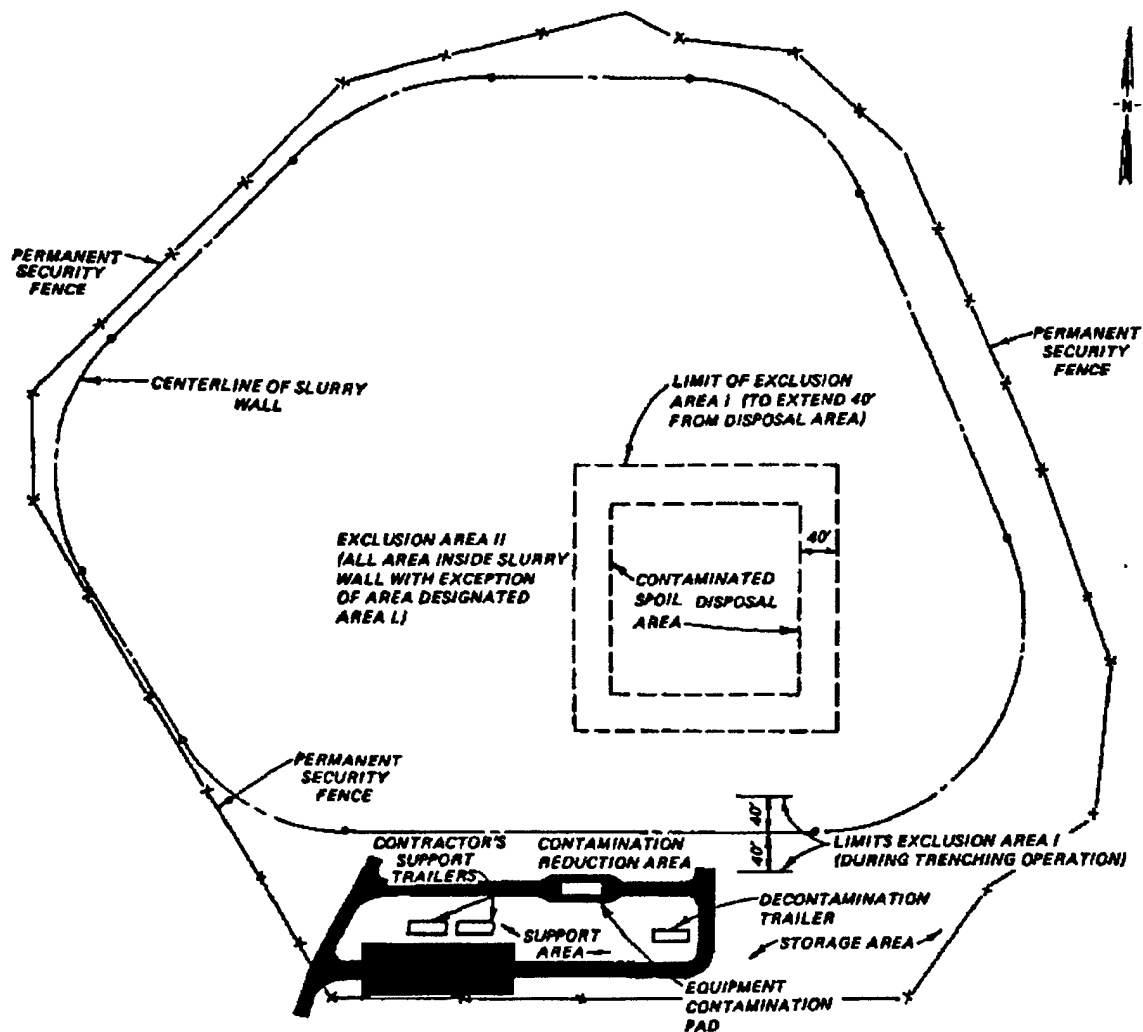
Design Drawing for Lipari Landfill Slurry-Trench Cutoff Wall
